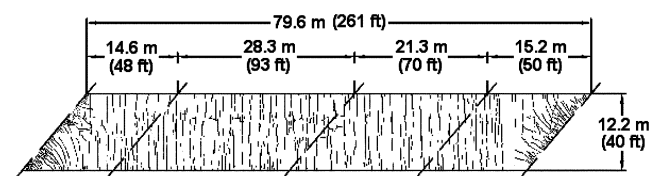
Sample bridge deck crack map.<sup>5</sup>
